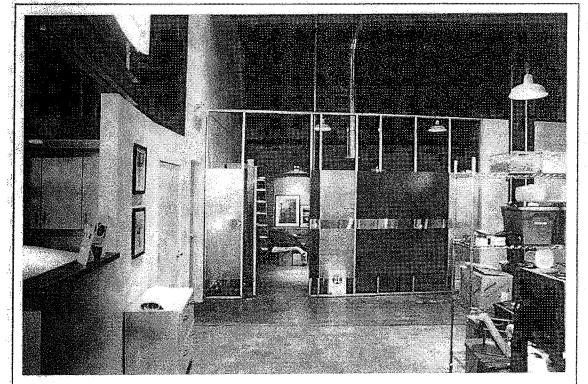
View Toward West Looking Inside Office Area Showing Office Partitions and Original Brick Wall and Window Niche
